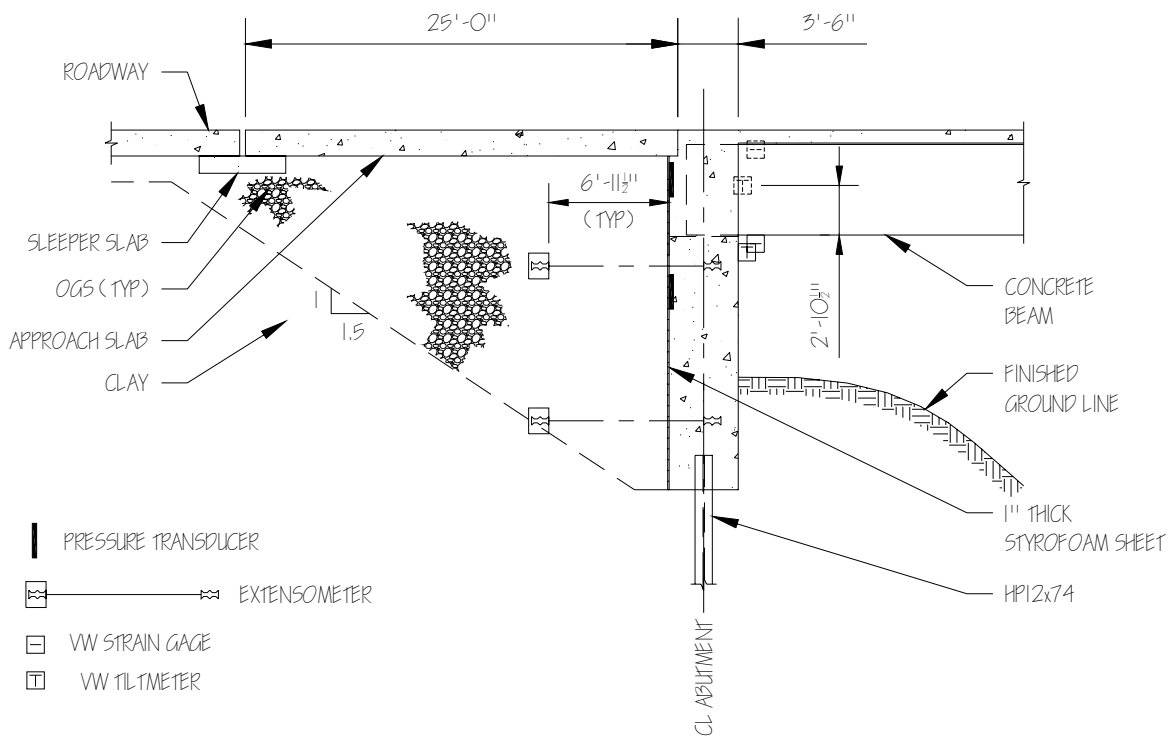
Structure 203 Cross-Section Through Abutment 2 (Section A-A)
